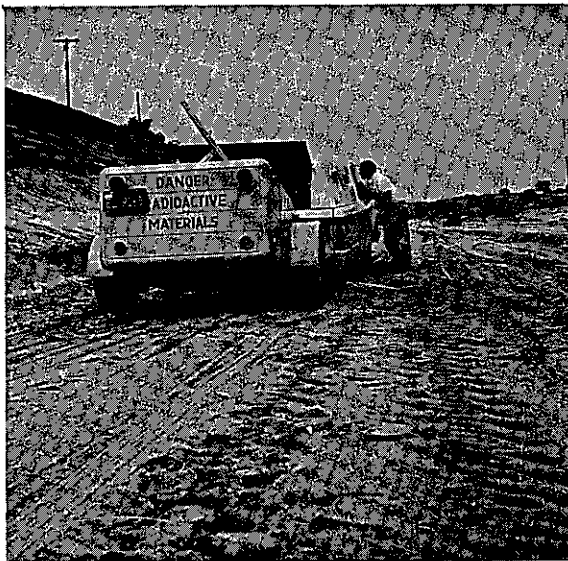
Rear view of Road Logger stuck on loose, sandy shoulder (PHOTO 16).
